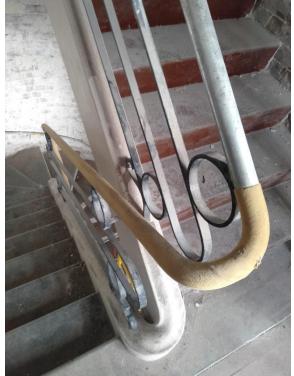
Decorative finishes to stairwell. (Source: GML, September 2024)
